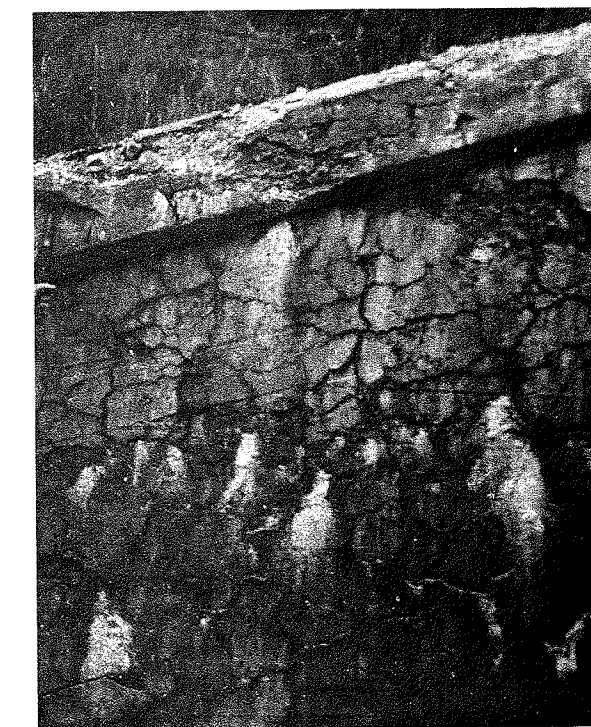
Cracking and deterioration of concrete retaining wall of railway viaduct near Valleyfield, Quebec. The aggregate is Potsdam sandstone
